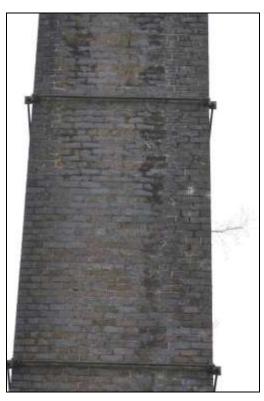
View of the northern elevations of the brick chimney at Riverside Business Park, Bakewell.
